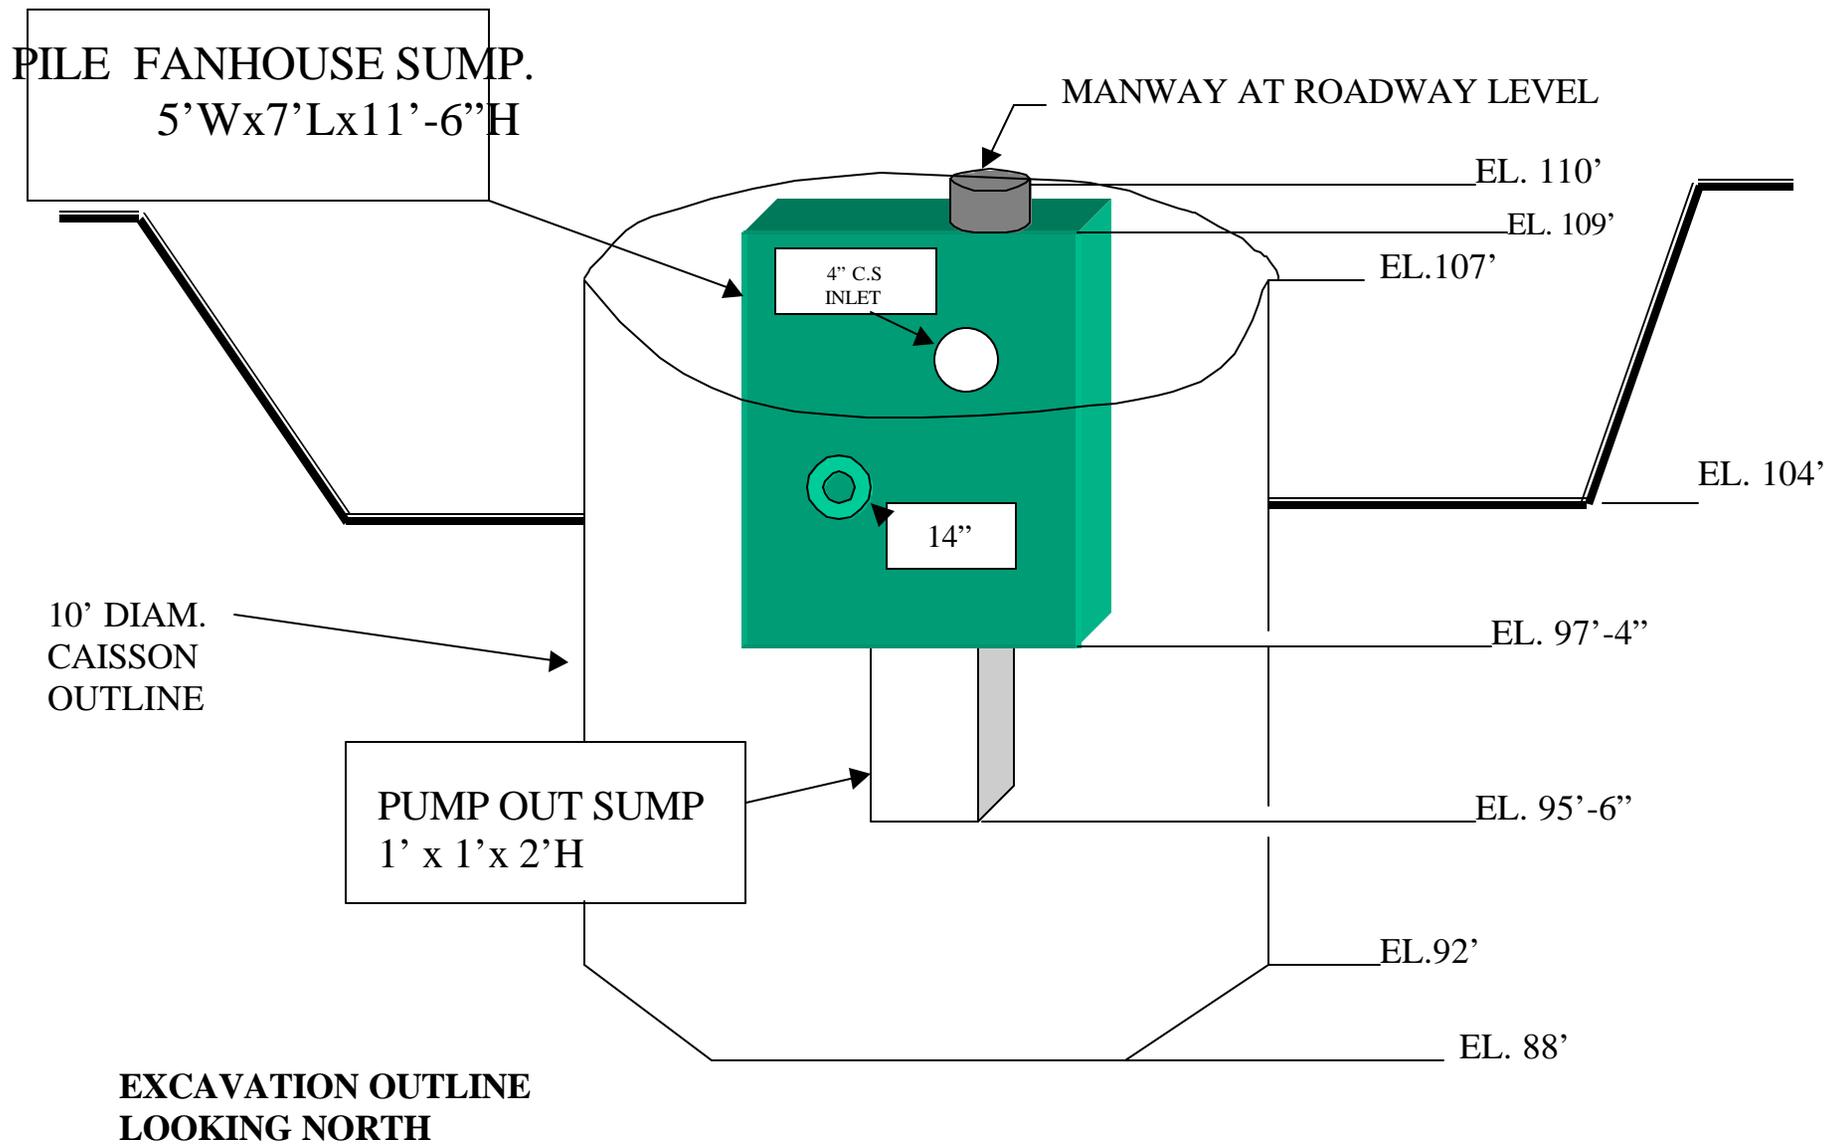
Pile Fan Sump Excavation Diagram Looking North
